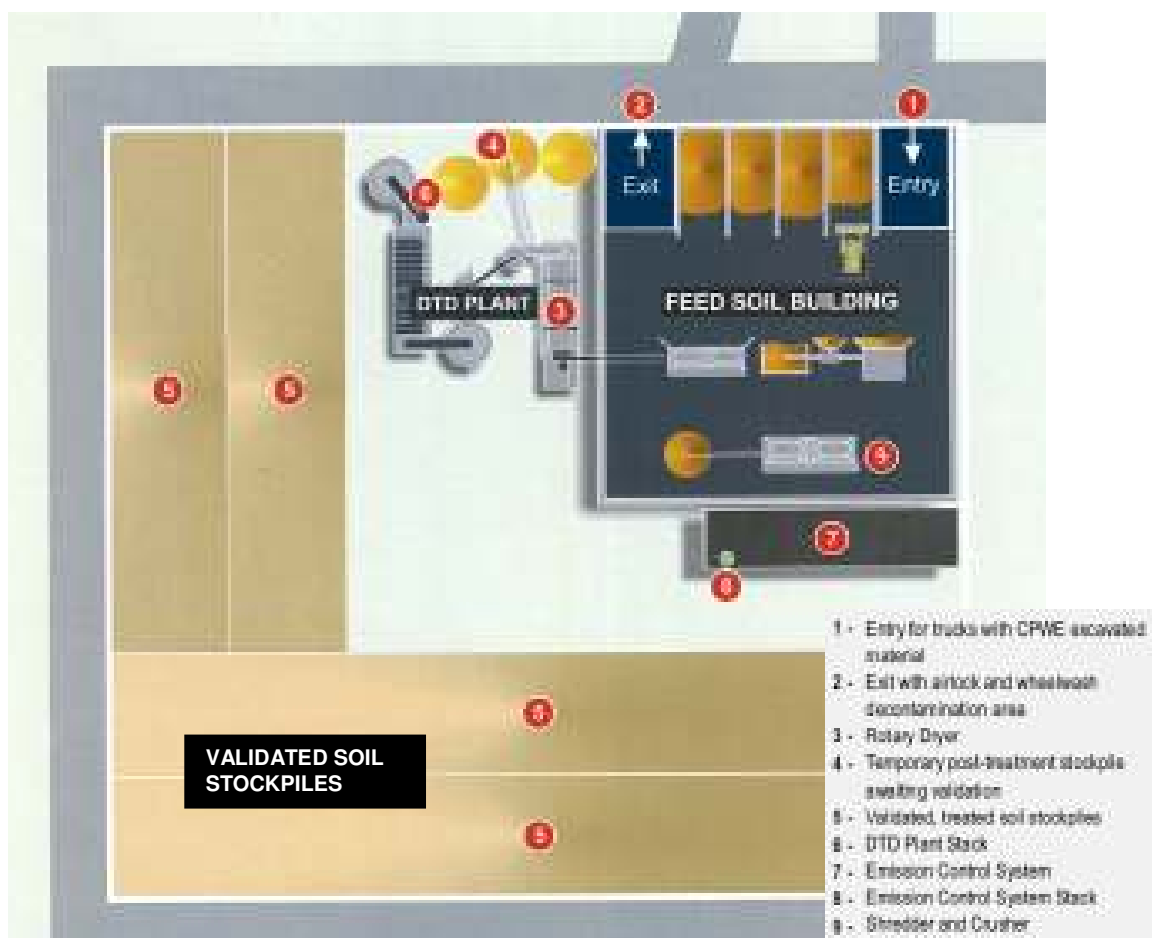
Feed Soil Building, Directly-Heated Thermal Desorption Plant and Treated Soil Stockpiles
